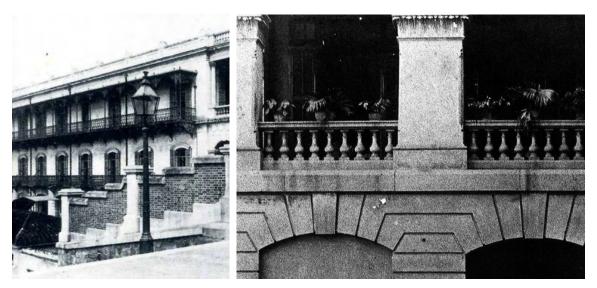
Iron balcony structures with pre-fabricated architectural elements on the side elevation of the former Central School facing Shing Wong Street. (left) and Factory-made urn-balustrades at the verandah of the former Central School (right). (from Ho Kwun Wan 何冠環, Huangren shuyuan lishi tupianji 皇仁書院歷史圖片集 [The photo collections of Queen's College], 1993, pp. 9, 19-21.)
